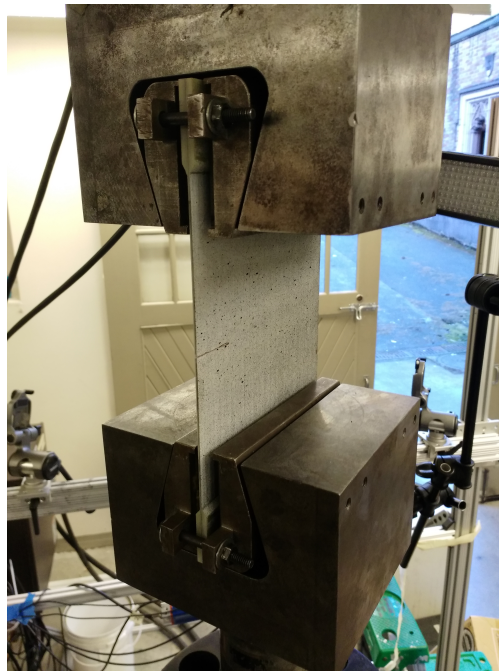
A closer view of the specimen being tested on the MTS testing machine
